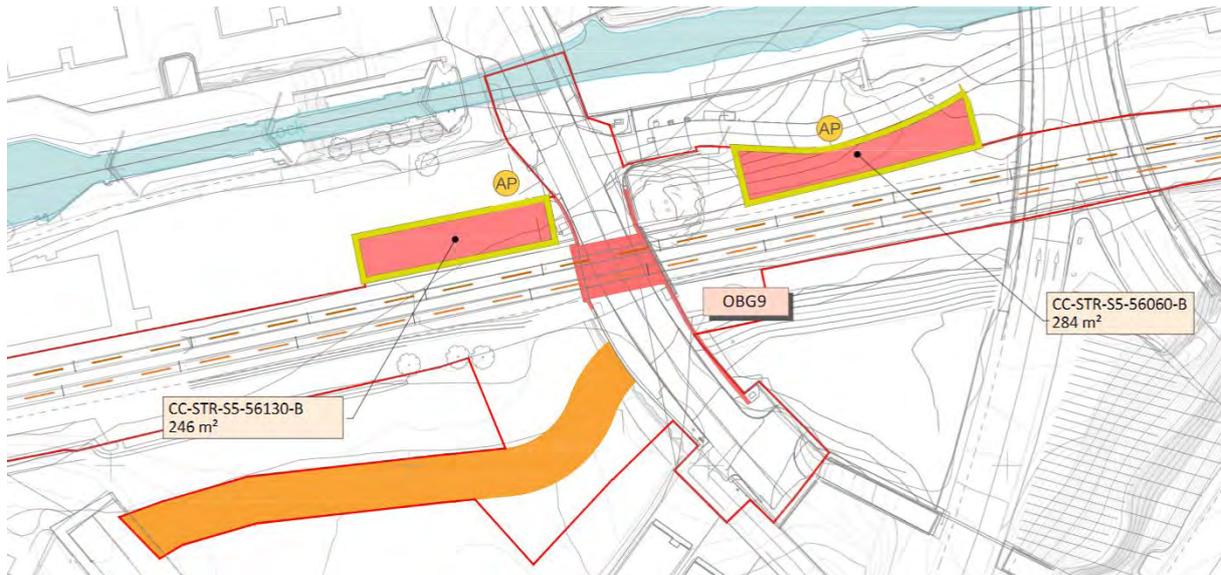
Plan of proposed temporary material storage area at OBG9
